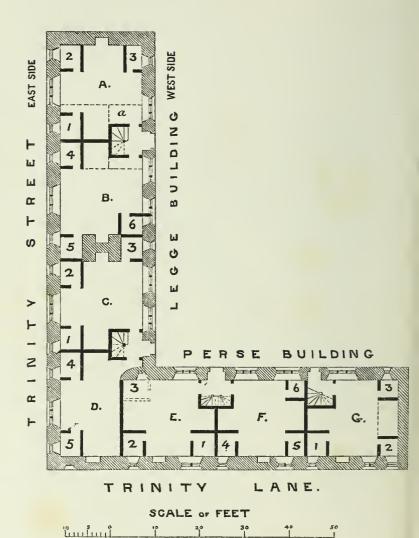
PLAN OF GROUND FLOOR OF THE PERSE AND LEGGE BUILDINGS AT GONVILLE AND CAIUS COLLEGE.
